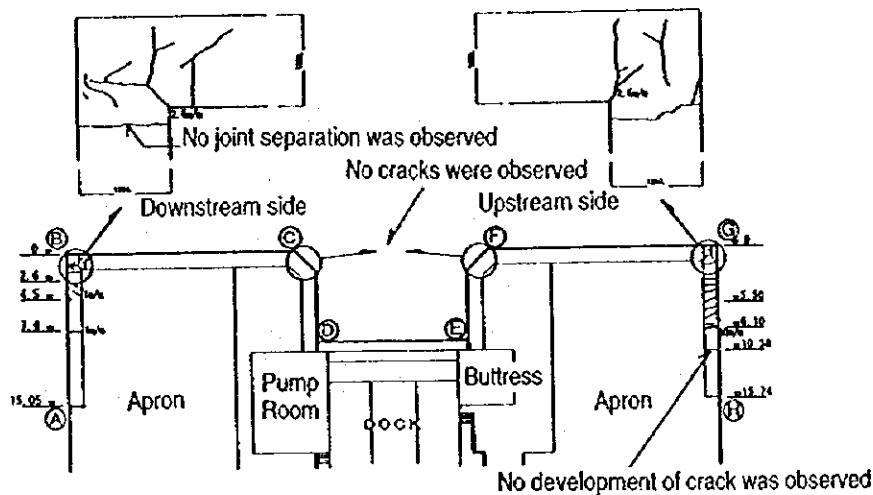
Crack Locations in the Coping Concrete Sections in the Upriver Revetment.
